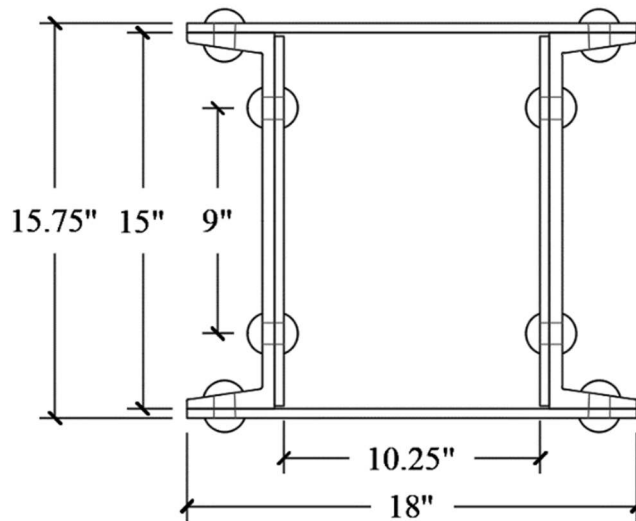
Cross section of Specimen 6 & 7 (shown with stay plates)
